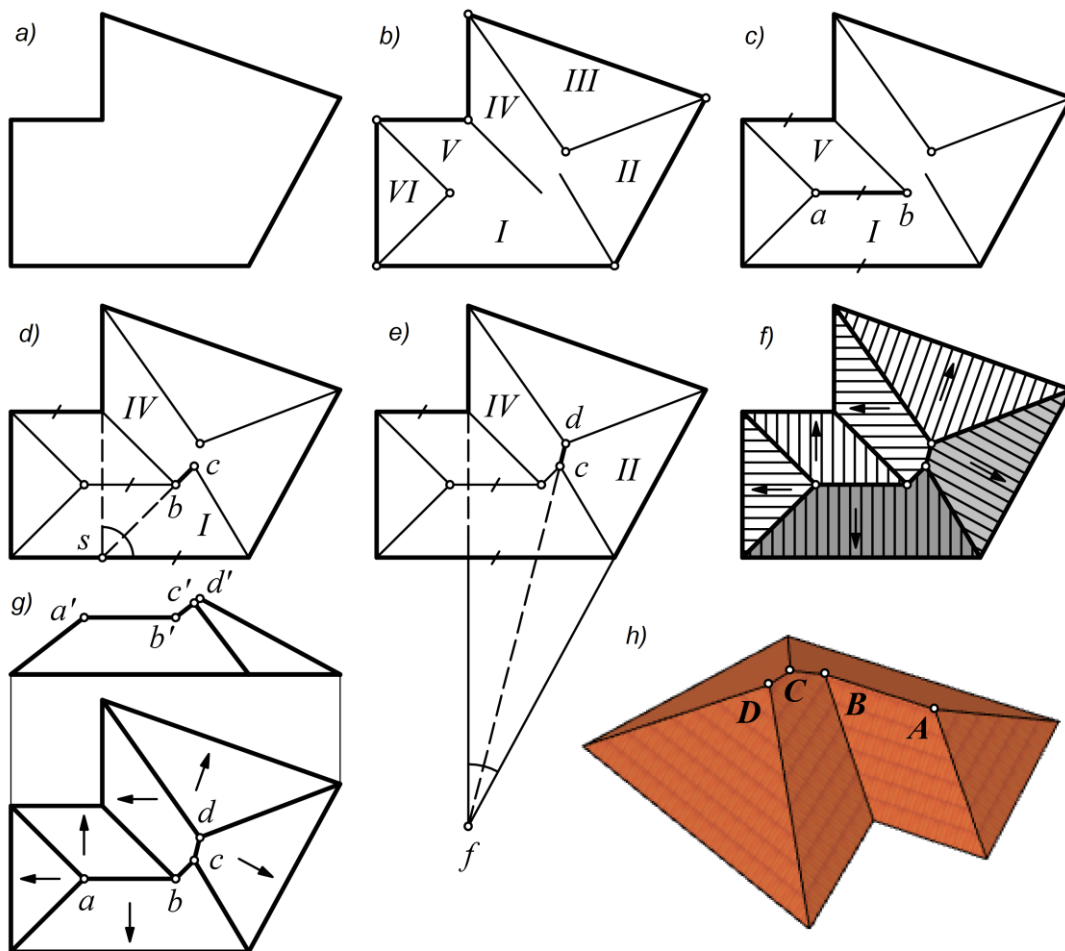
Construction of roof plan (a-f), roof facade and plan (g) and perspective view of the roof (h)
